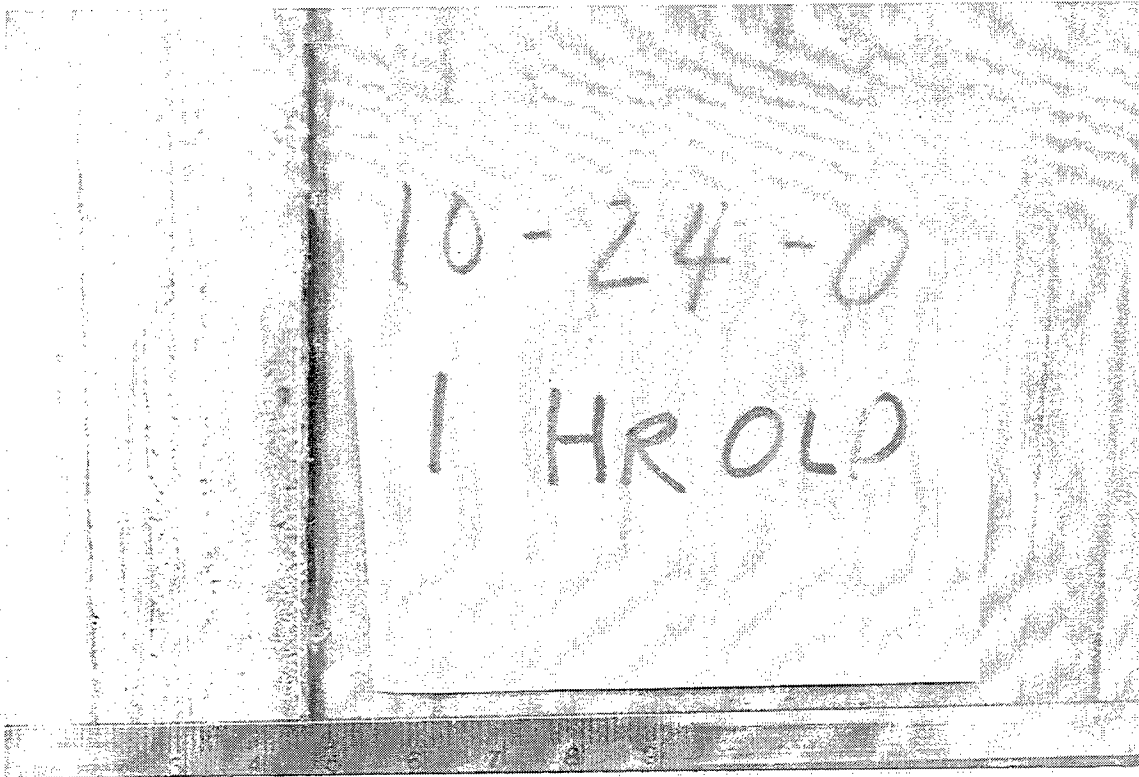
Cement-board formwork coated on the outside shows moisture penetration approximately 5 mm into the cement board 1 hr after placement
